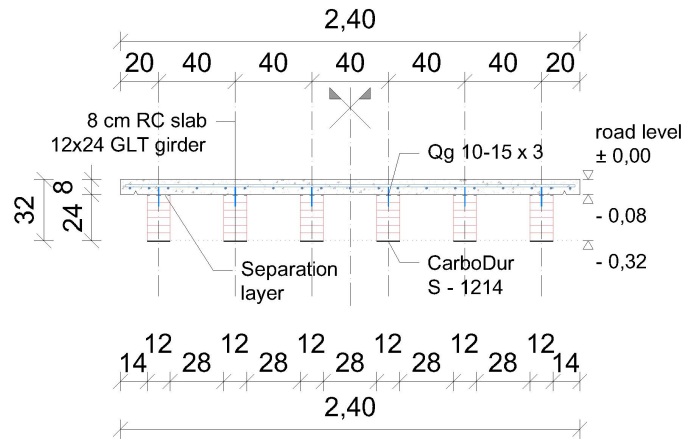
Cross-section of a six girders bridge model (TC-B)
